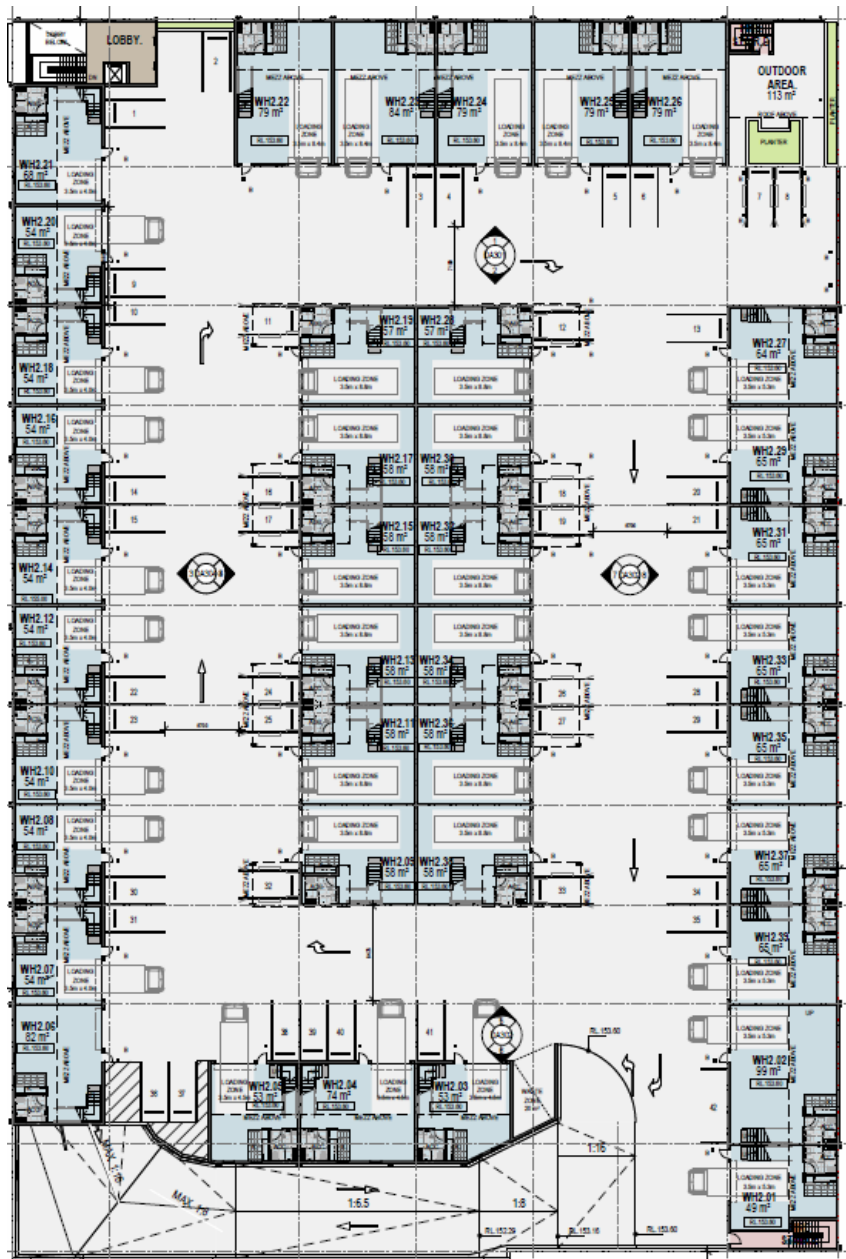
Level 2 Floor Plan (Source: SBA Architects)
